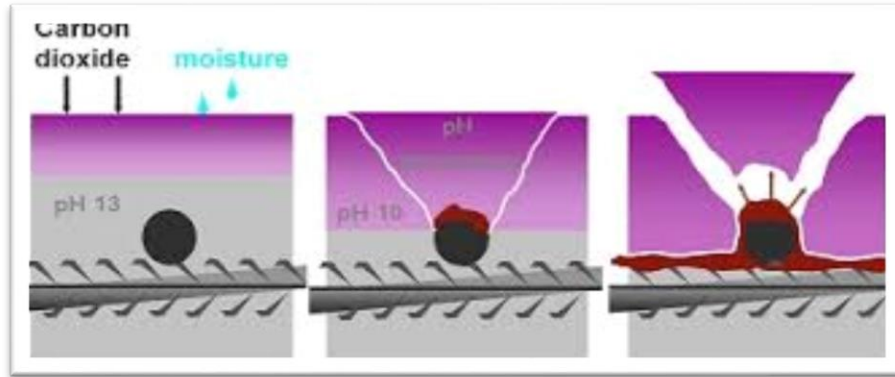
Cracking and spalling of concrete cover due to corrosion of reinforcement [1]
